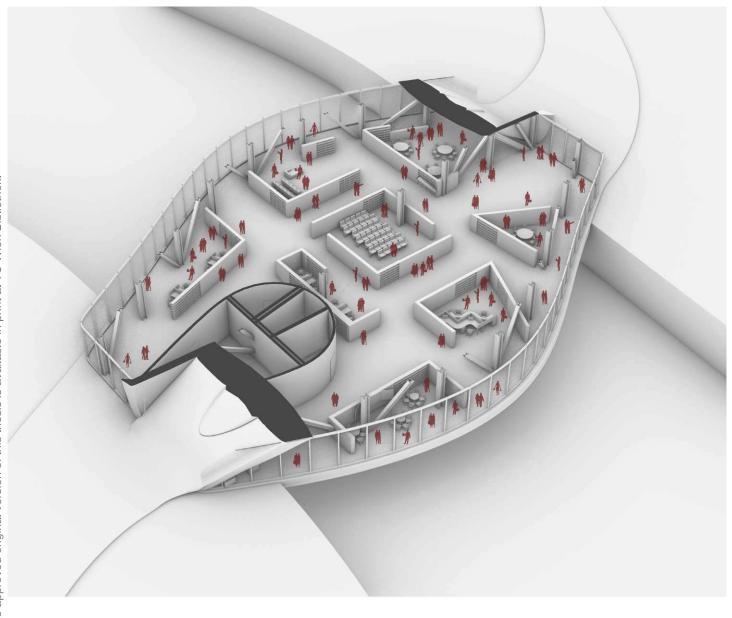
3d Axo - Building is used for workshops and seminars
